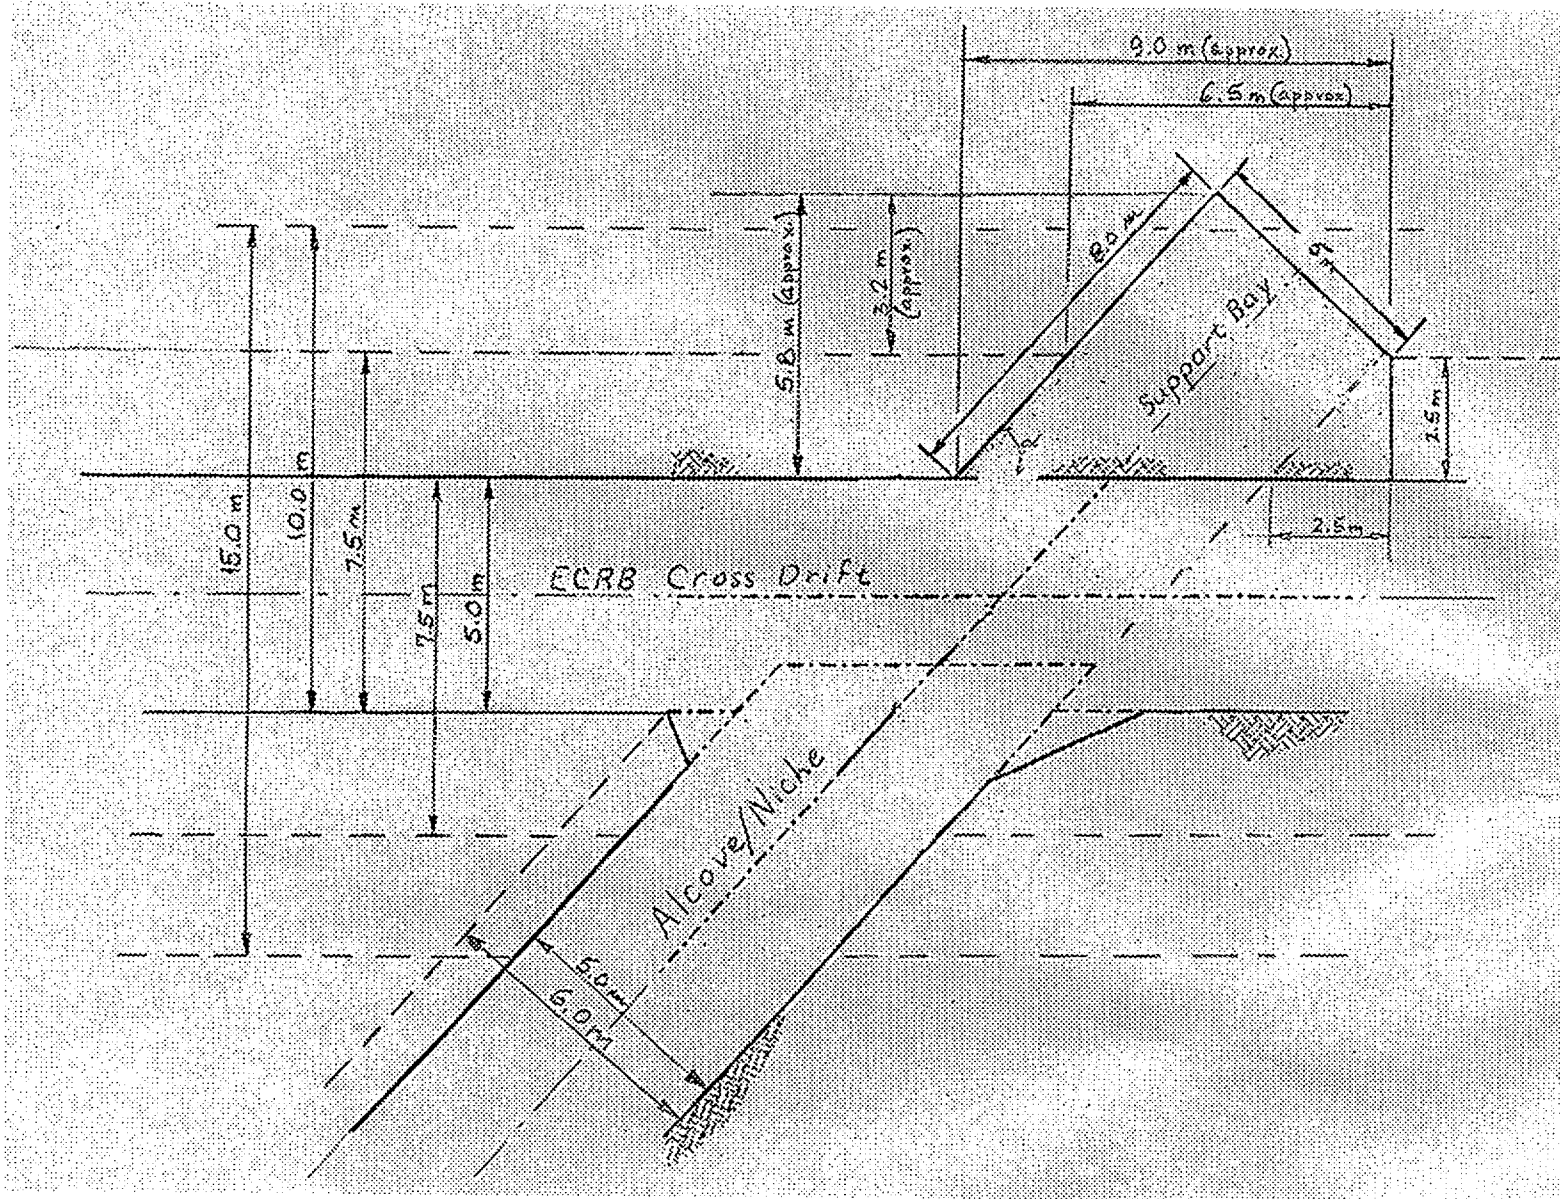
Typical Four-Way ECRB Tunnel/ Test Alcove Intersection.
